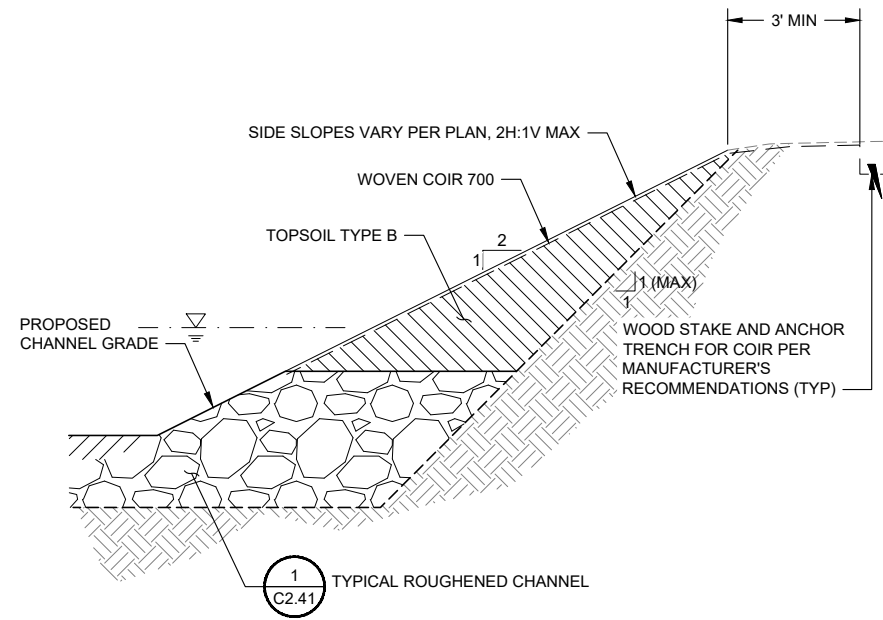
DETAIL - TYPICAL TERRACED BANK RESTORATION FOR STEEP SLOPES
